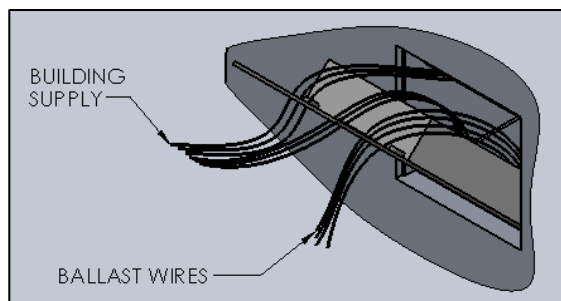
DETAIL SHOWING BUILDING SUPPLY AND
